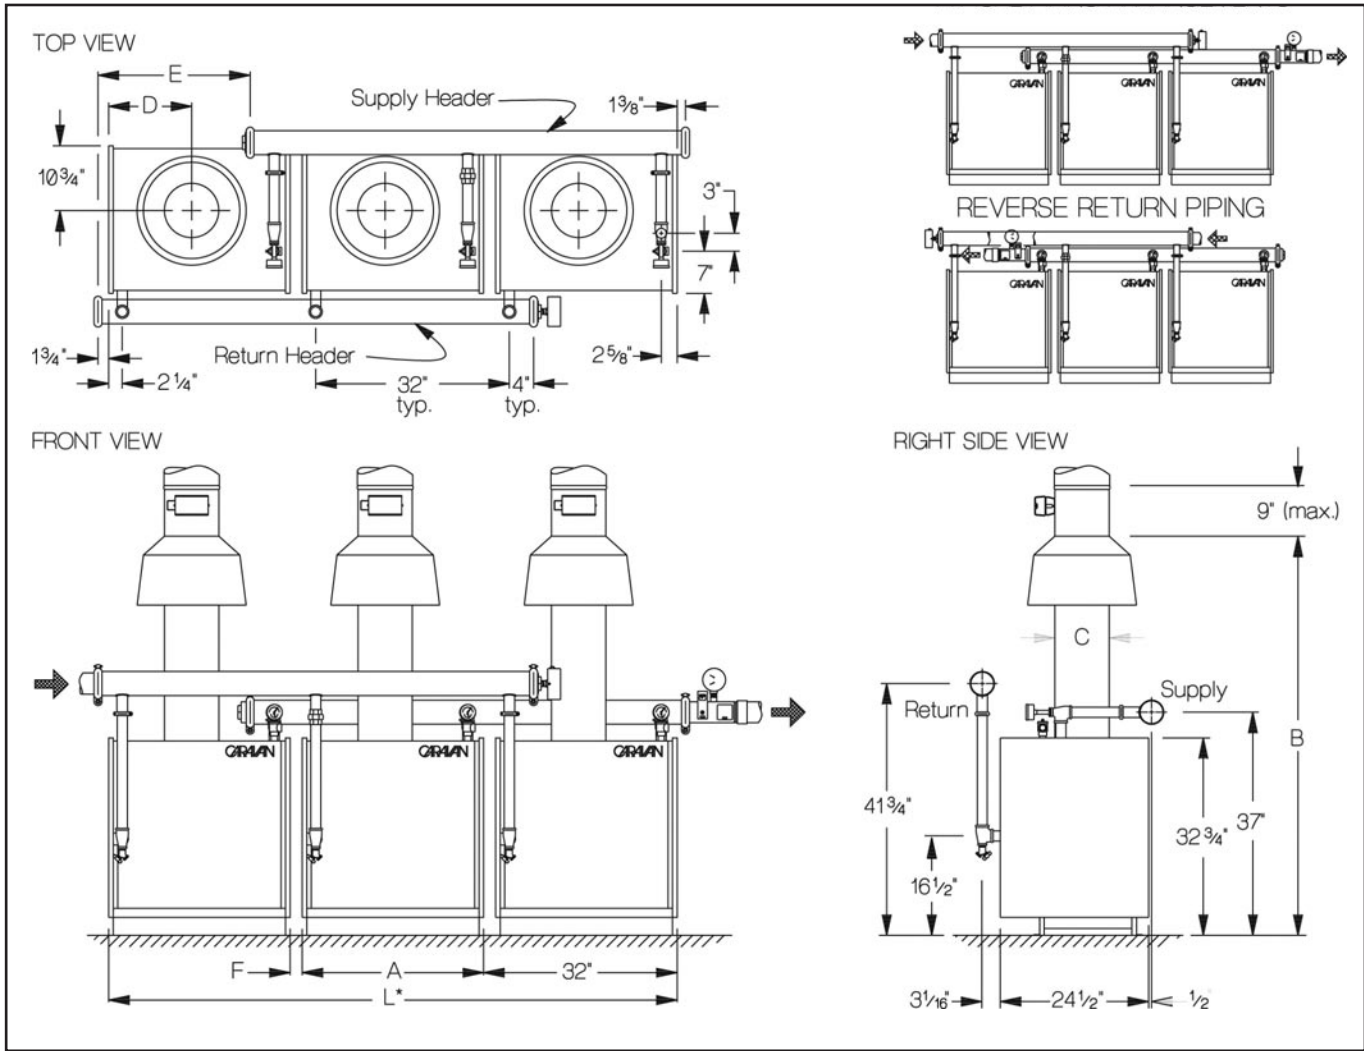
Gas Caravan dimensions and typical piping/hot water models
